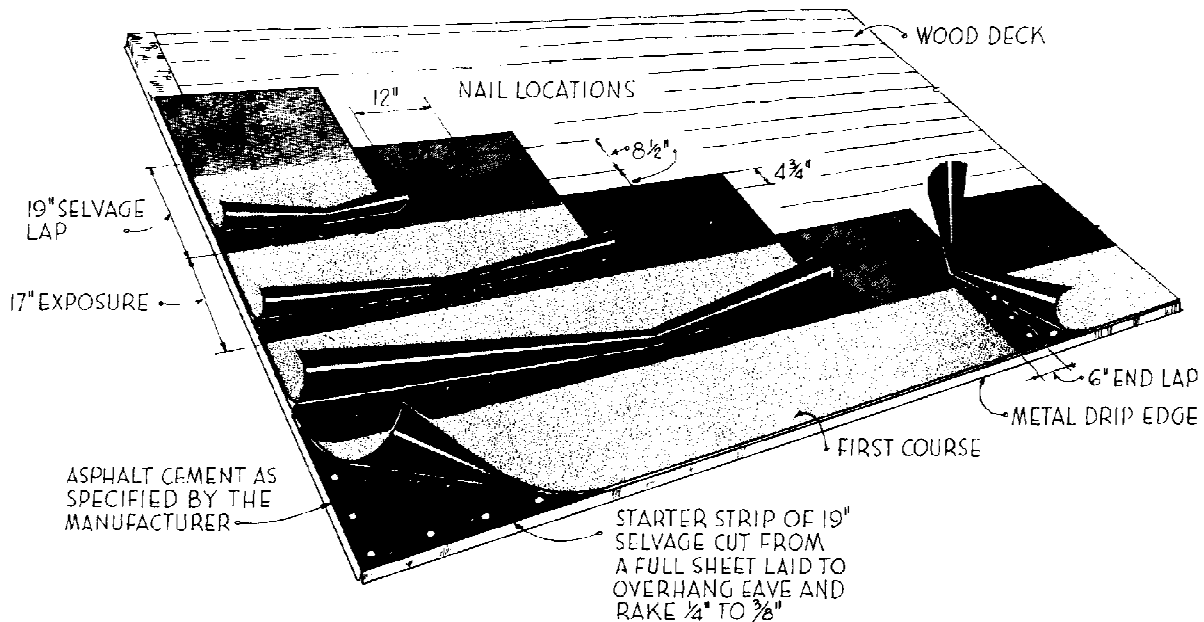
Application of double coverage (wide selvage) roll roofing parallel to the eaves.
